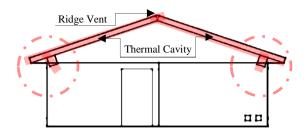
Section cut showing ceiling ducts and gable roof channel/cavity of model 2.
